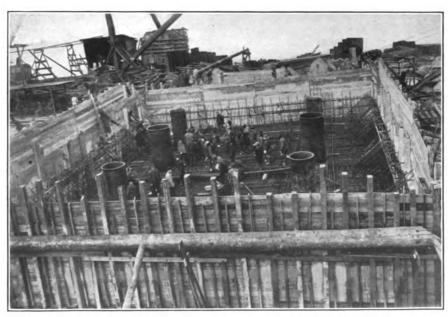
Fig. B.—Hales Bar dam, placing reinforcement and locks for concrete caisson.
